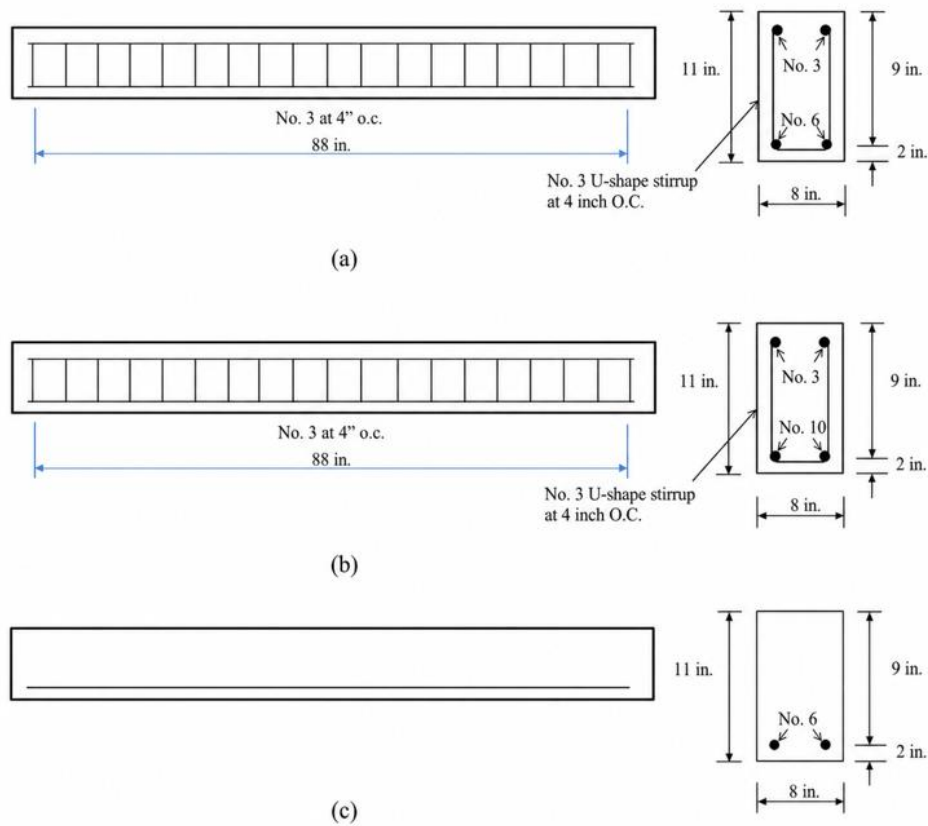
Reinforcement configurations of the experimental beams: (a) under-reinforced beam, (b) over-reinforced beam, and (c) shear-failure beam.
